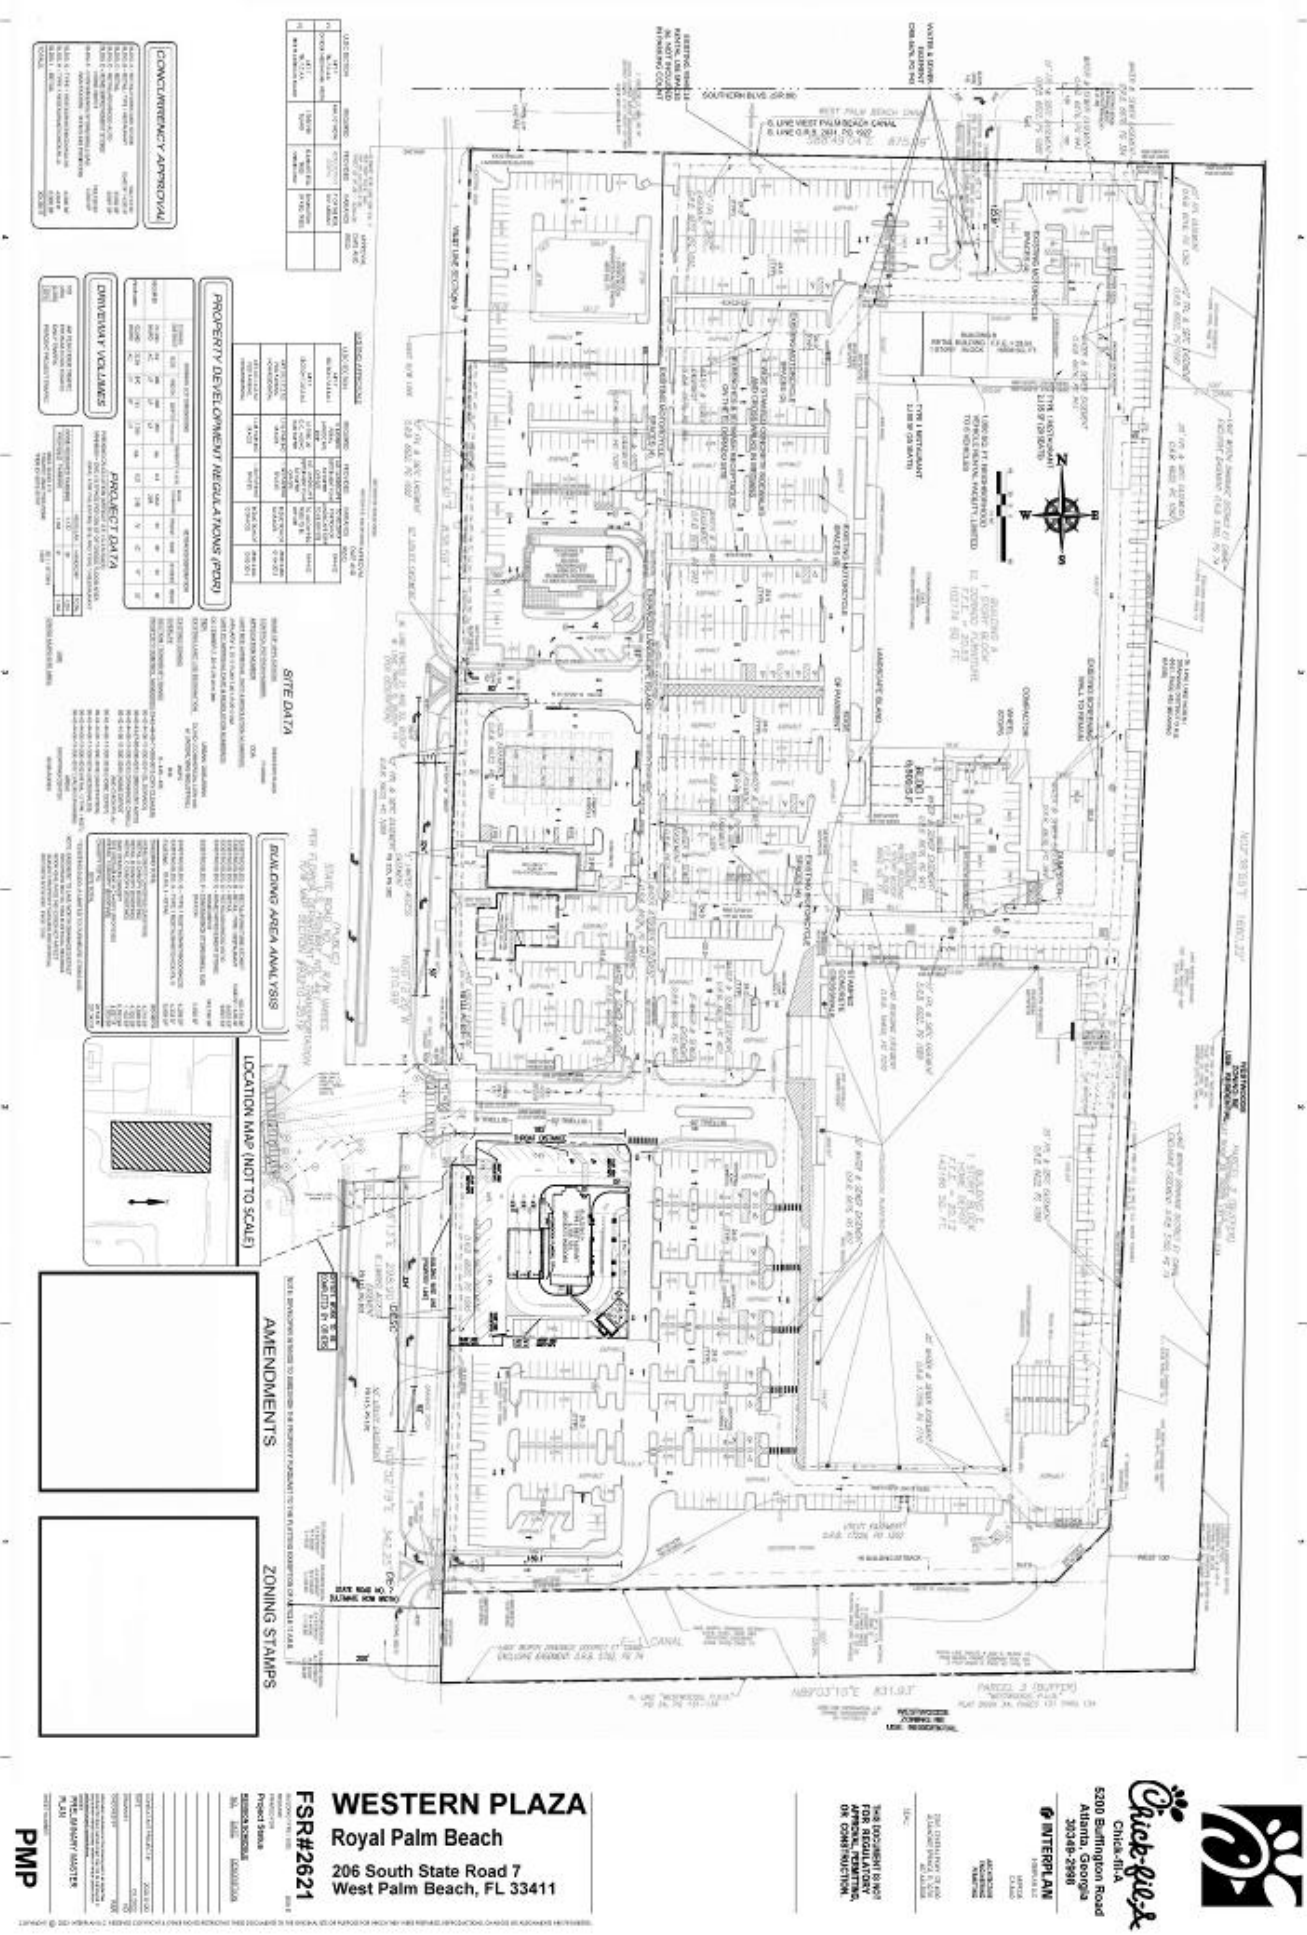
Preliminary Overall Site Plan dated July 14, 2023
